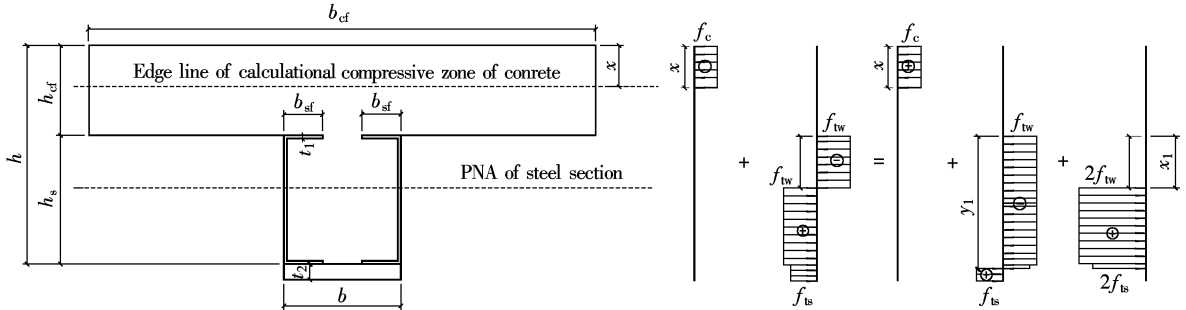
Stress distribution when plastic neutral axes of steel beam and concrete beam are within a steel web and concrete flange
